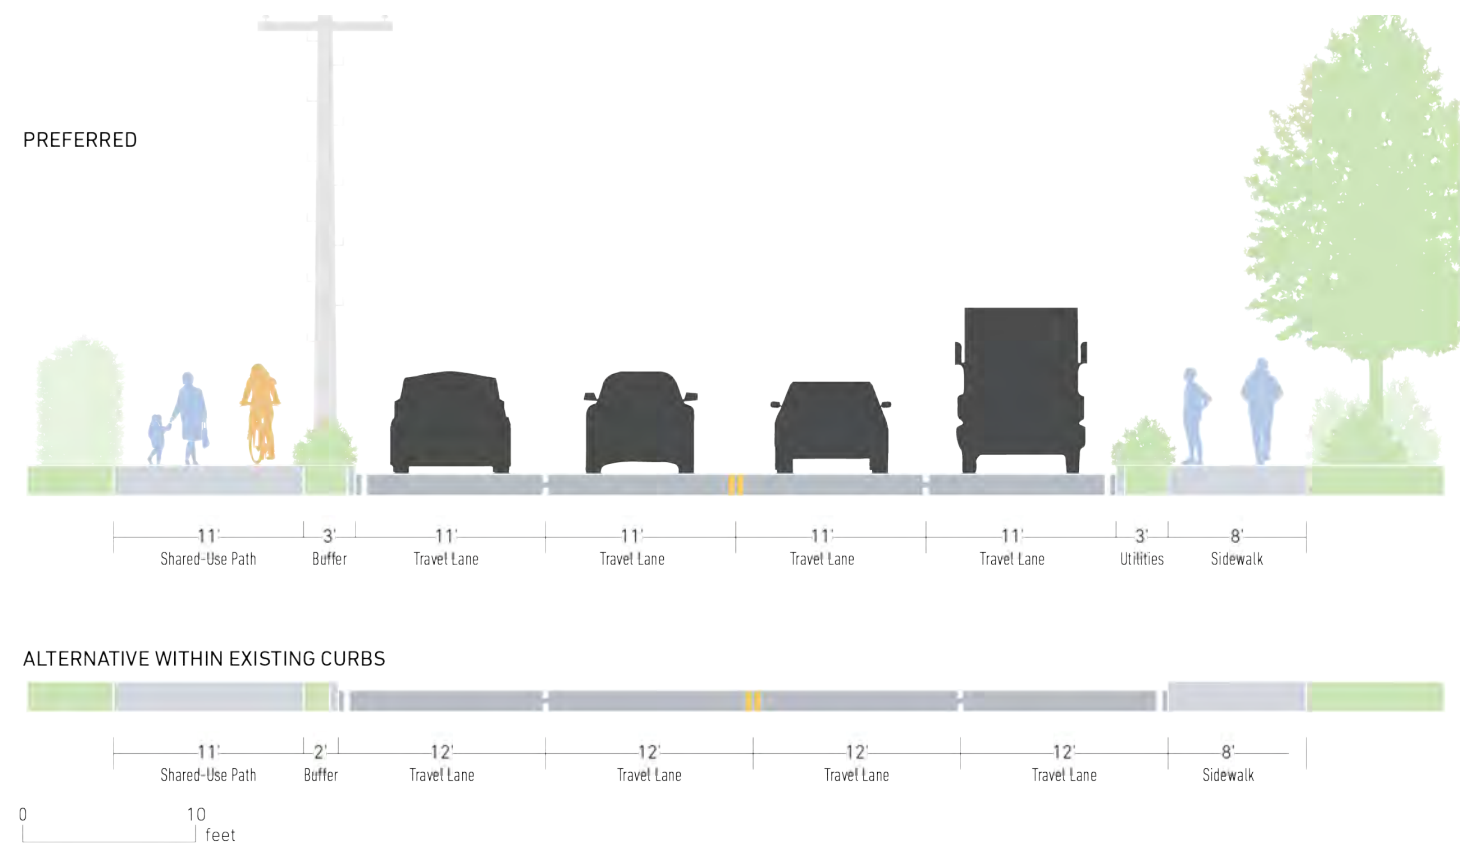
Preferred street design, with alternative option for the existing curbs, for Housley Road.
